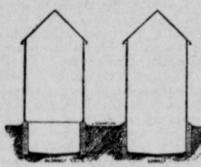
Correct and Incorrect Methods of Constructing Silo Foundations.
